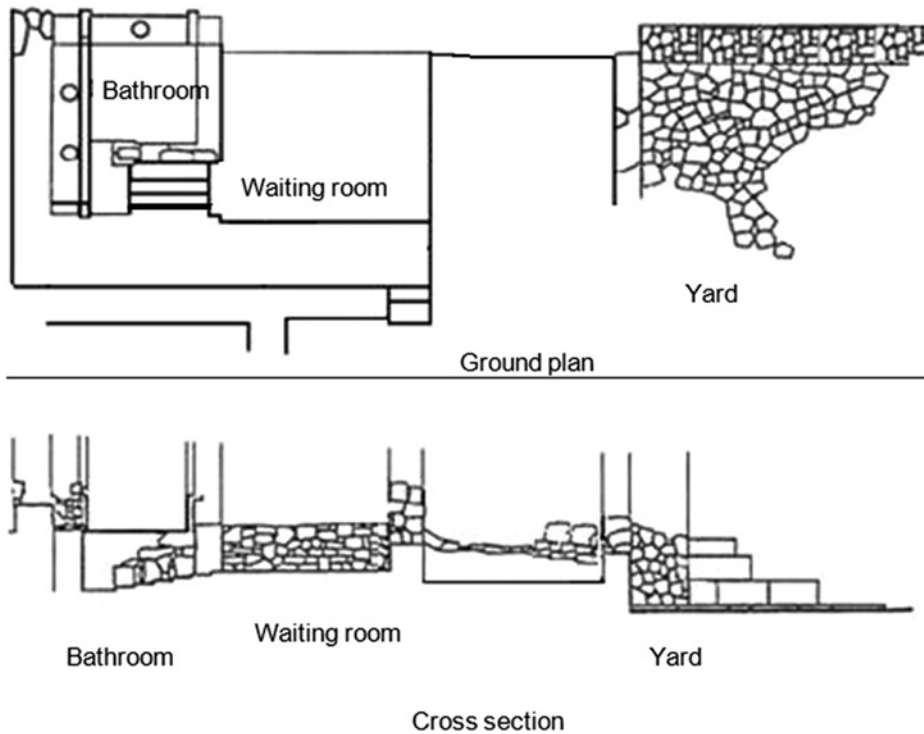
Bathroom in the palace of Zakros: Ground plan (up) and cross section (down) (modified from Platon, 1974).
